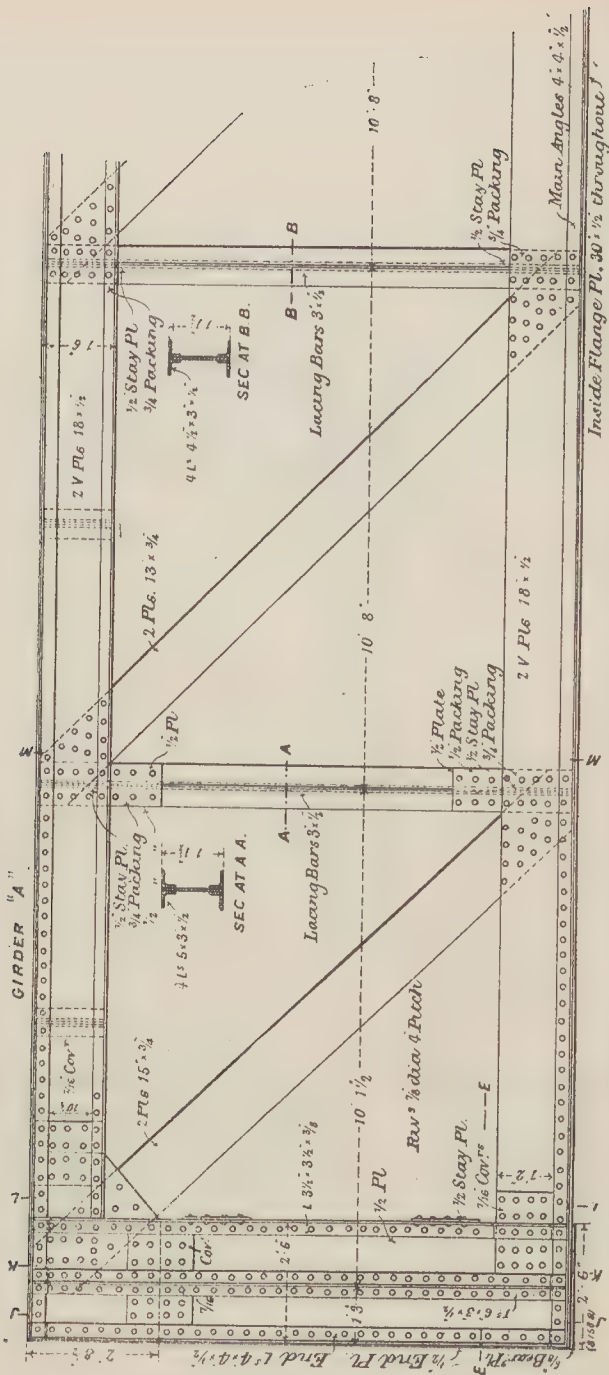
"N" Girder Bridge over River Clyde, Caledonian Railway.
